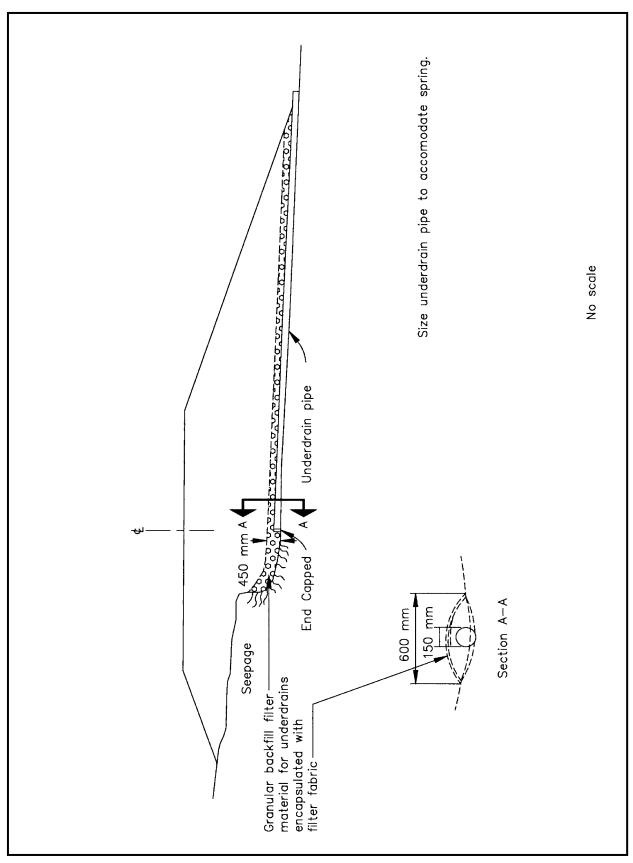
M TYPICAL UNDERDRAIN INSTALLATION FOR SPRING AREAS (Metric)
